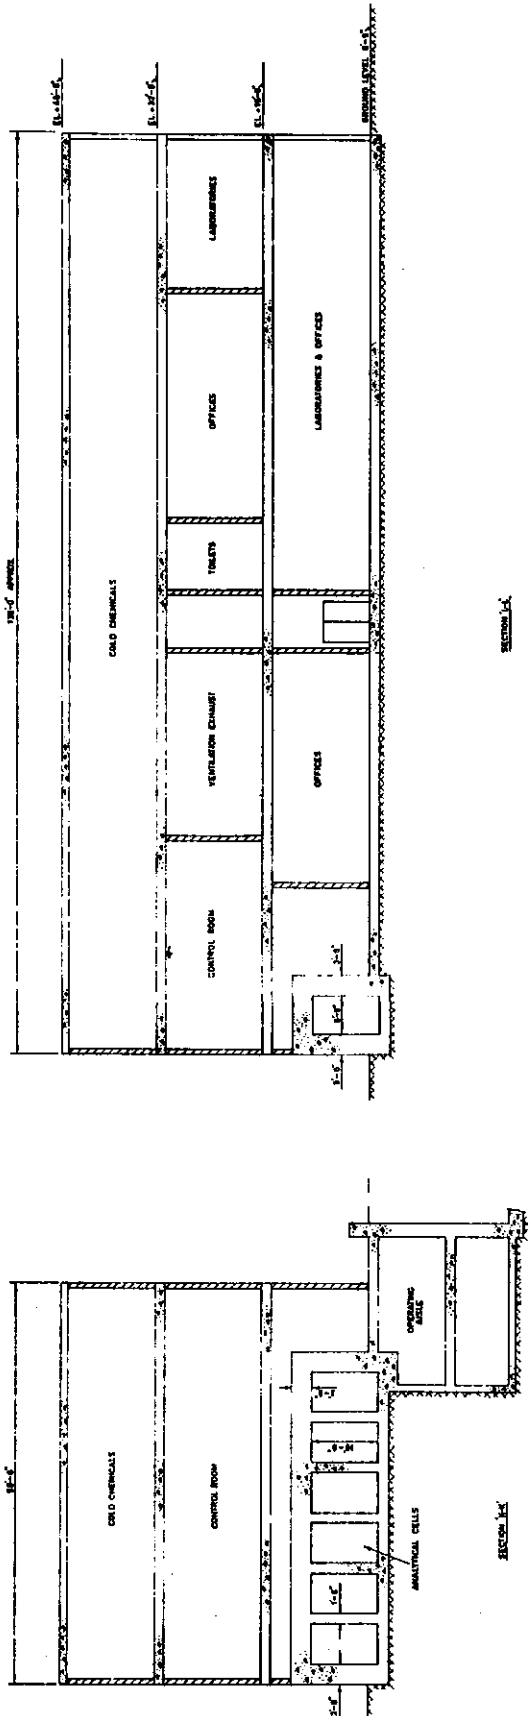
BUILDING LAYOUT - SECTIONS G-G AND H-H
